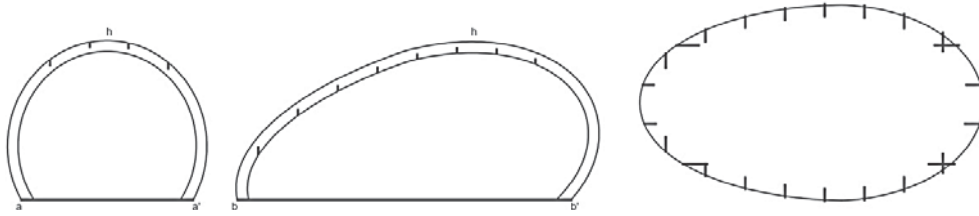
Structural plan: Transversal arch (left); longitudinal arch (centre); floorplan (right).
